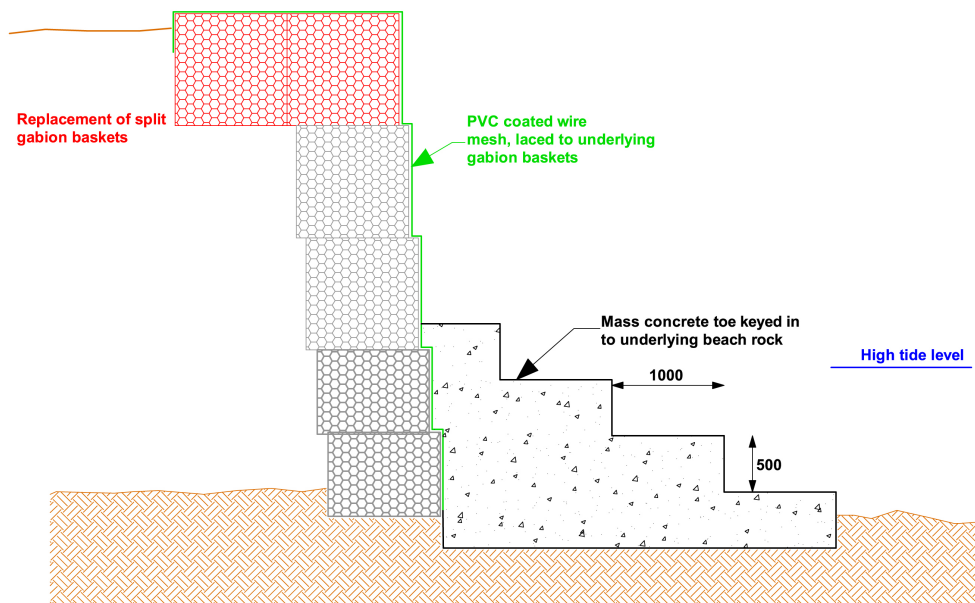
Repair details to Sections 2 and 6 along the southern side of Fale. Dimensions in mm.
